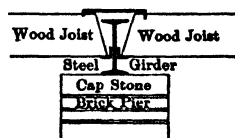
Joists Supported by Shelf Angles Riveted to Girder
